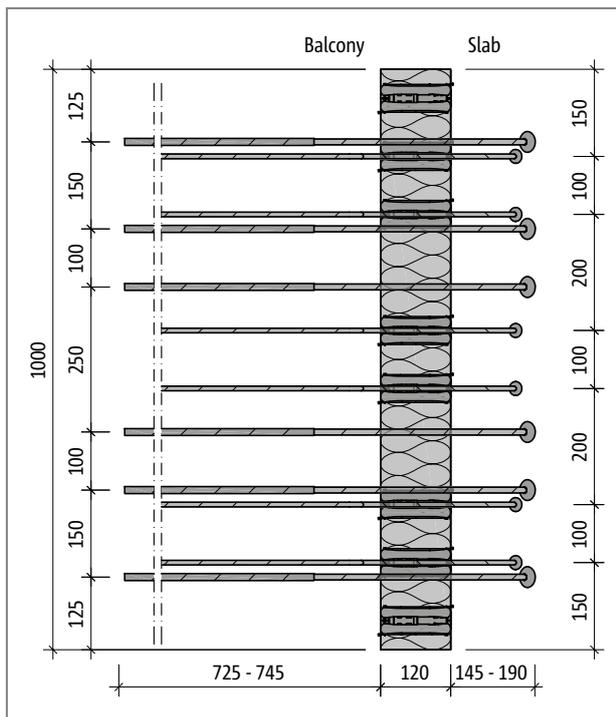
Schöck Isokorb® XT type K-O-M2: Product plan view
